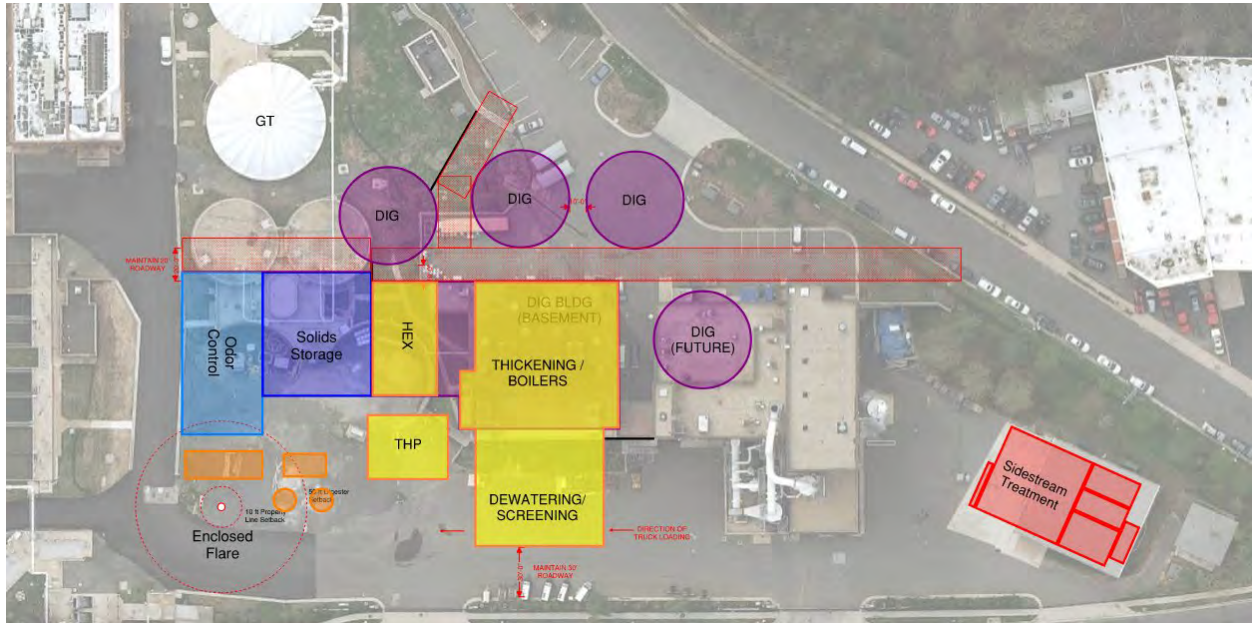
Preliminary Site Layout, Alternative 3: New Pre-dewatering and Final Dewatering Facility
